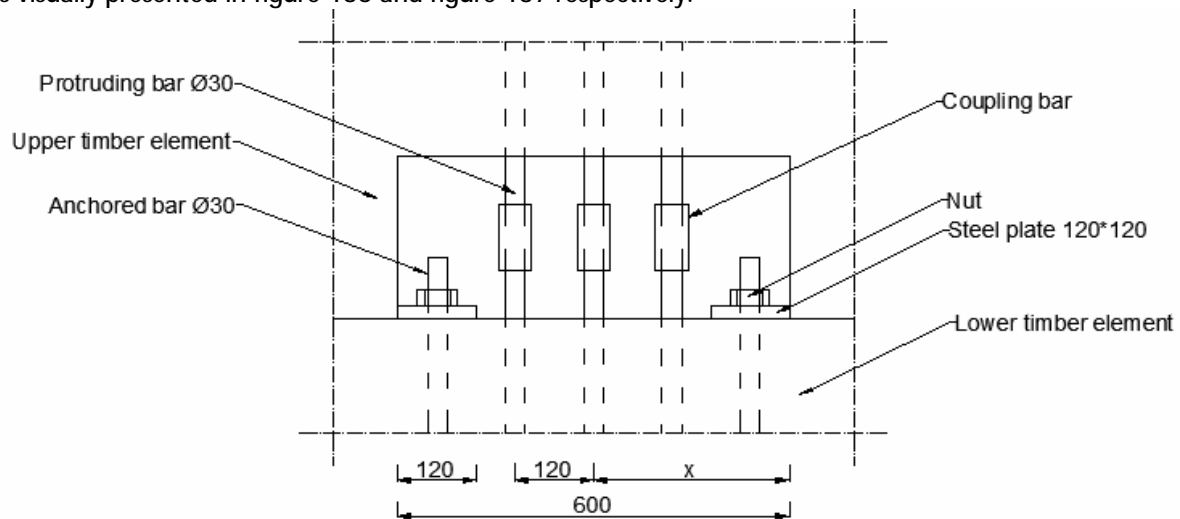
Proposed anchorage above the -2<sup>nd</sup> floor core segment
